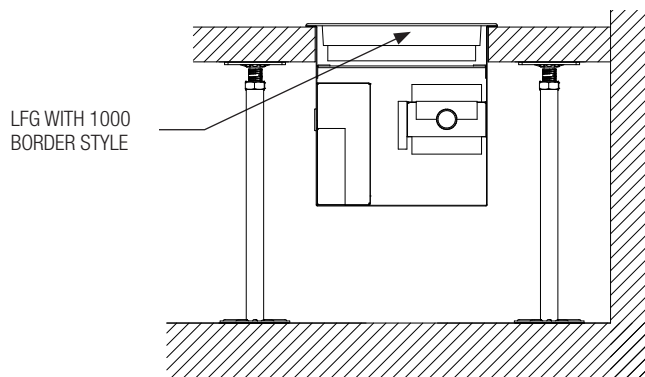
LNT FLOOR TILE SUPPORTED PLENUM WITH LFG GRILLE INSTALLED ▼
